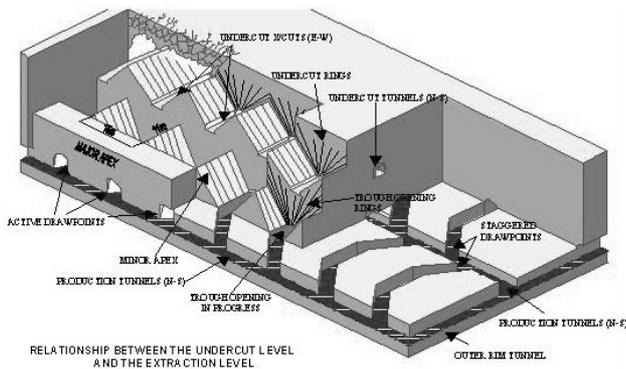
A 3-D model of cave mining method, on the herringbone layout
